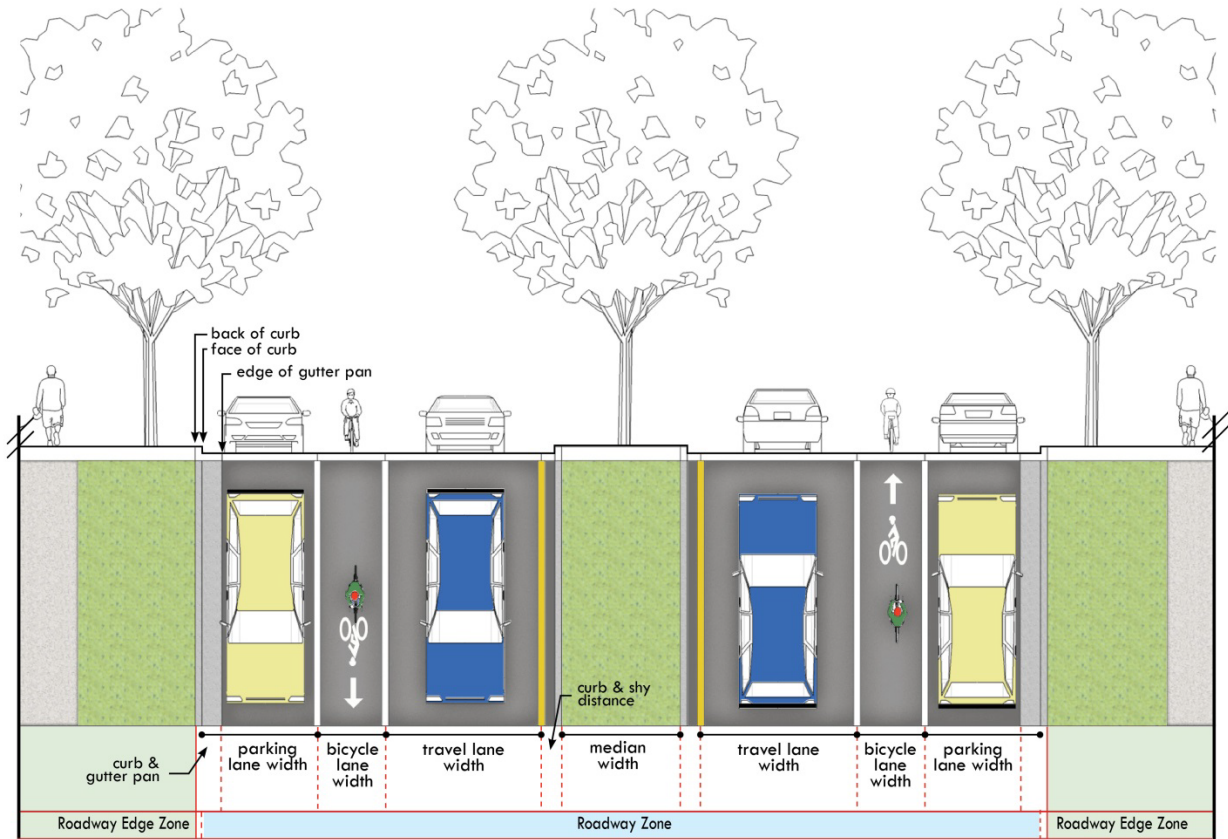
Roadway Zone Cross-Section with Bicycle Lanes and On-Street Parallel Parking. On-street parking lane widths include the width of the gutter pan.
